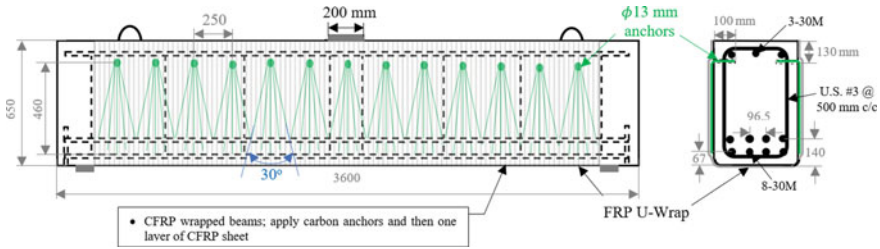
Schematic of beam strengthened with anchored CFRP sheet
